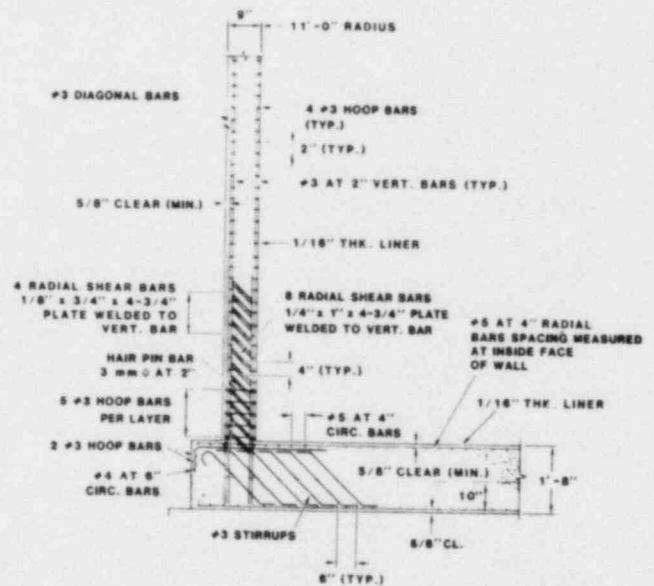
Reinforcement Plan at Cylinder-Wall and Basemat Junction
